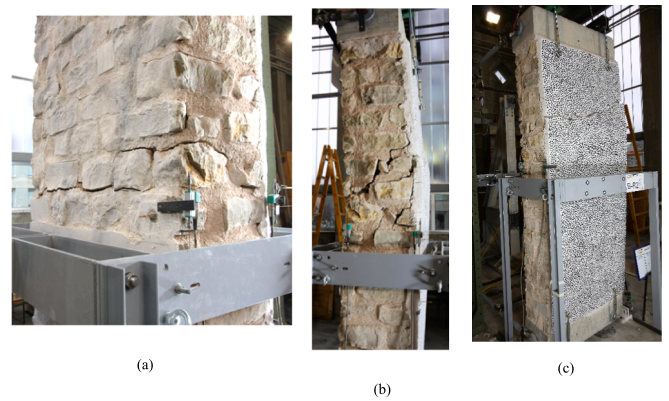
(a) Crack on the unstrengthened side of the pier at - 22 mm and (b, c) final collapse of the pier.
